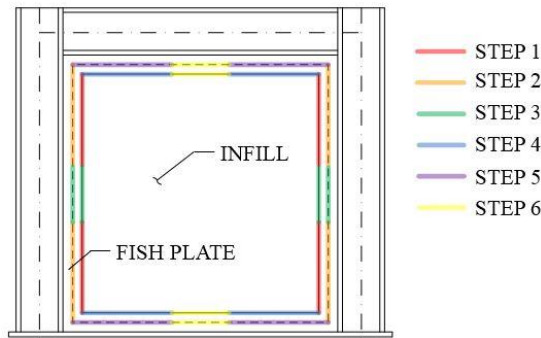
Schematic view of the infill to fish plate welding sequence
